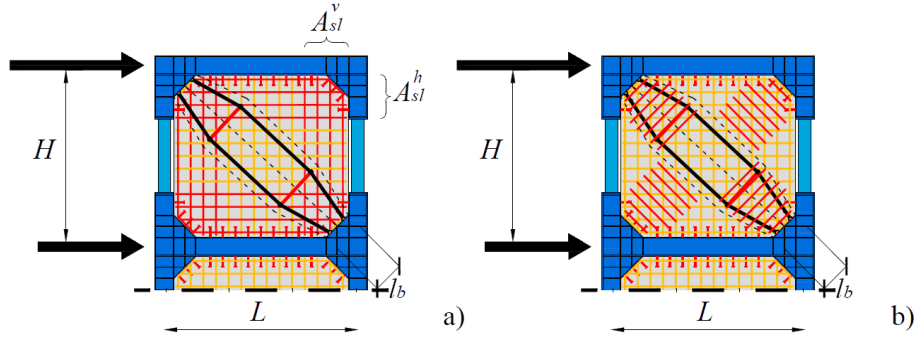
(a) reinforcements constituted by orthogonal rebar layout; (b) reinforcements constituted by additional stirrups.
